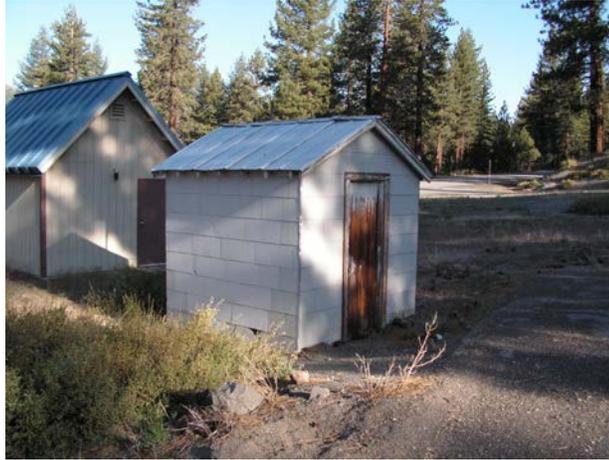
Asbestos-containing cementitious shingles, Valve Building No. 1
